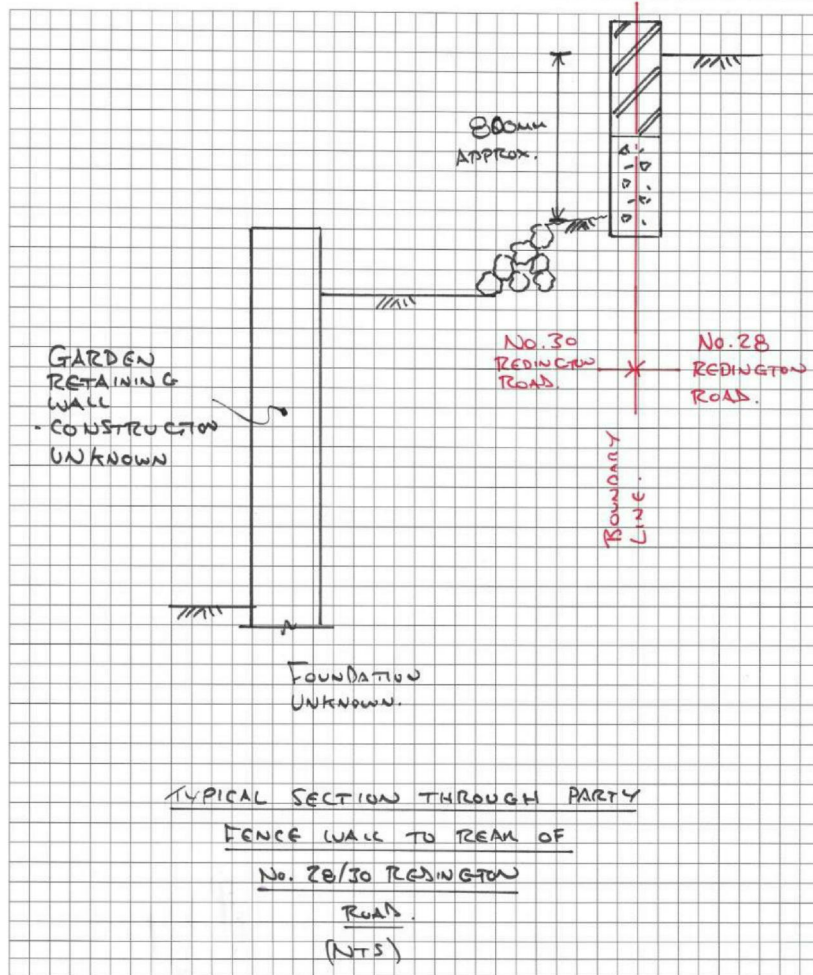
Typical section through party fence retaining wall to rear of No. 28/30 Redington Road
